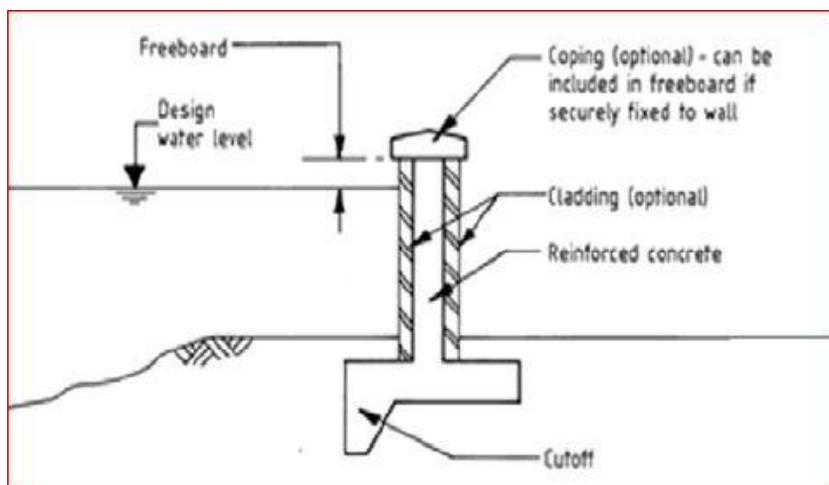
NACCS Floodwall Cross Section (Concrete T-Wall)
